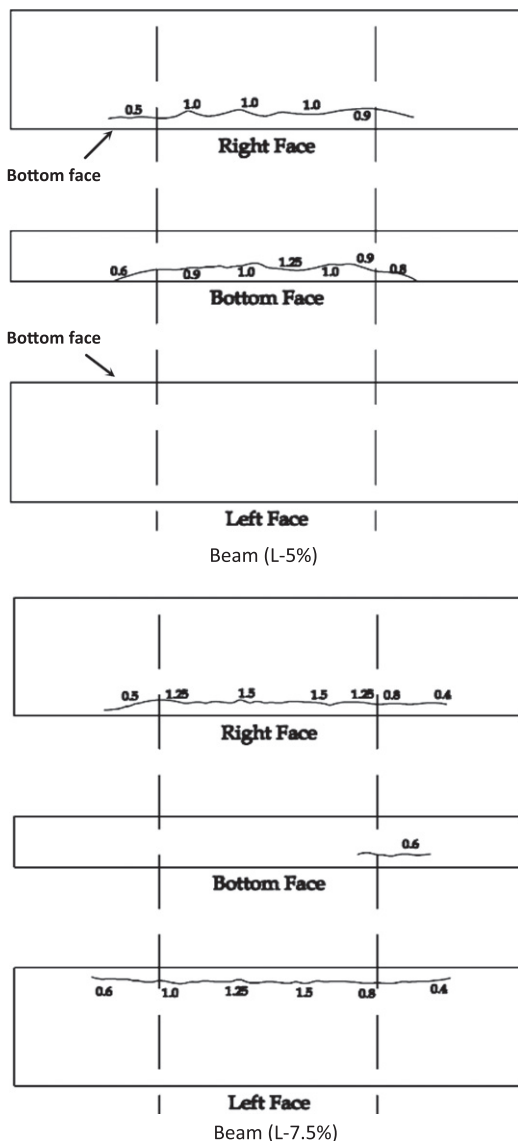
Typical corrosion crack patterns and crack widths (all crack widths are in mm).
